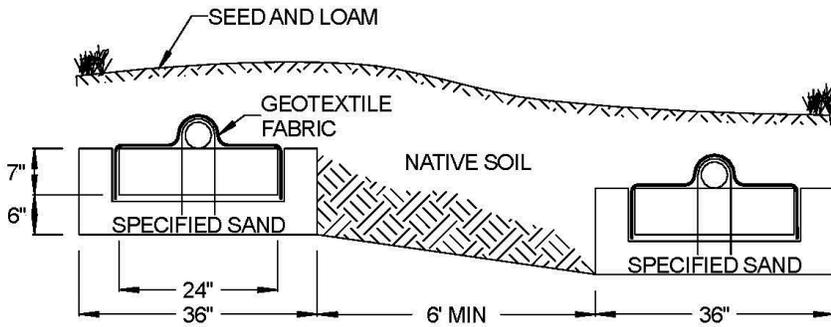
SECTION VIEW – TRENCH SYSTEM – SLOPING SITE
